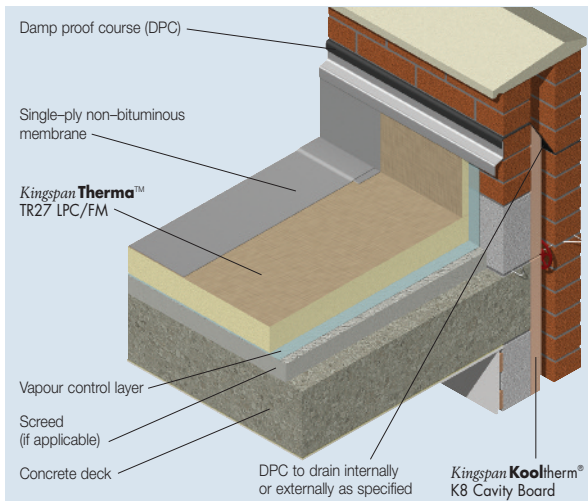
Insulation Installed Above a Concrete Deck – Single-ply Membrane
